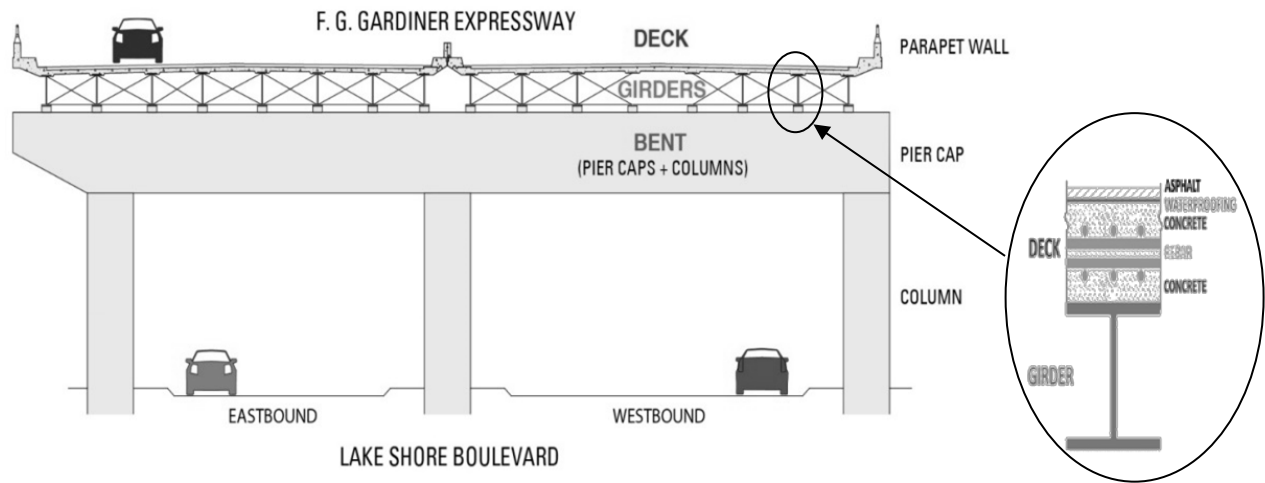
Typical cross-section of the "elevated" section of the F.G. Gardiner Expressway showing deck, girders, and bents supported by columns and pier caps, and providing an enlarged cross-section of the deck composition showing the asphalt, waterproofing and rebar on top of the concrete base.
